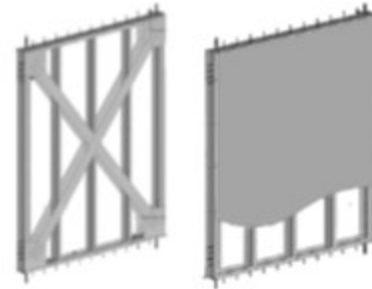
Lightweight steel systems: a) Strap braced walls; b) Shear walls with steel sheet or wood sheathing or gypsum sheathing
